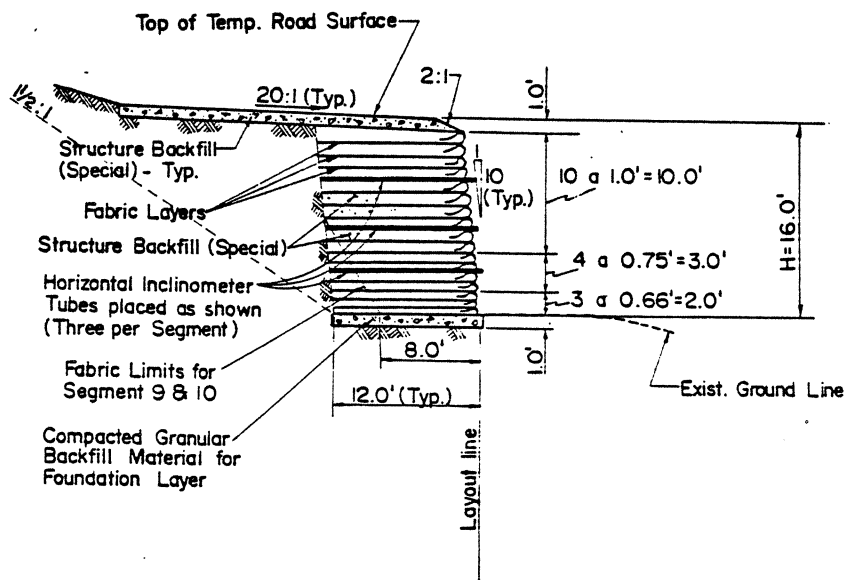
Temporary flexible retaining wall using geotextile fabrics.
